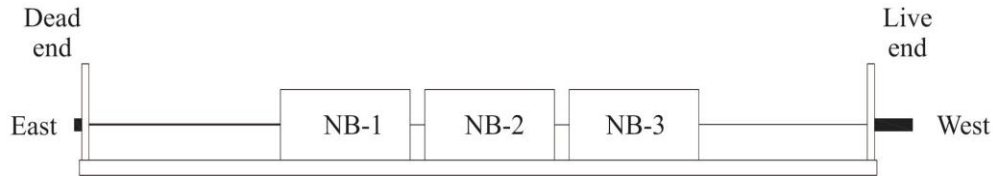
Specimen orientation on prestressing bed: NB precast beams (not to scale)
